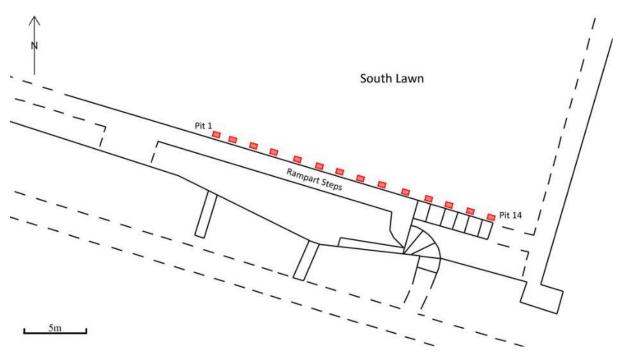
Location of completed pits on south lawn, starting with Pit 1 at the west end to Pit 14 in the east.
